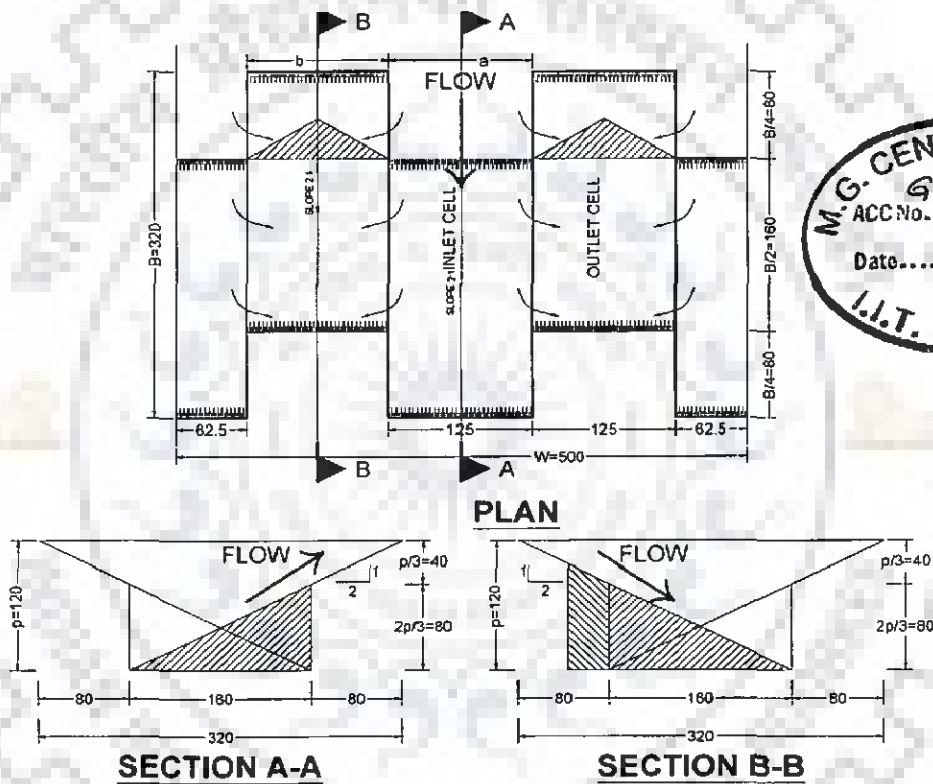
Plan and section of model  $P_2M_4$  with inlet modification (dimensions in mm)
